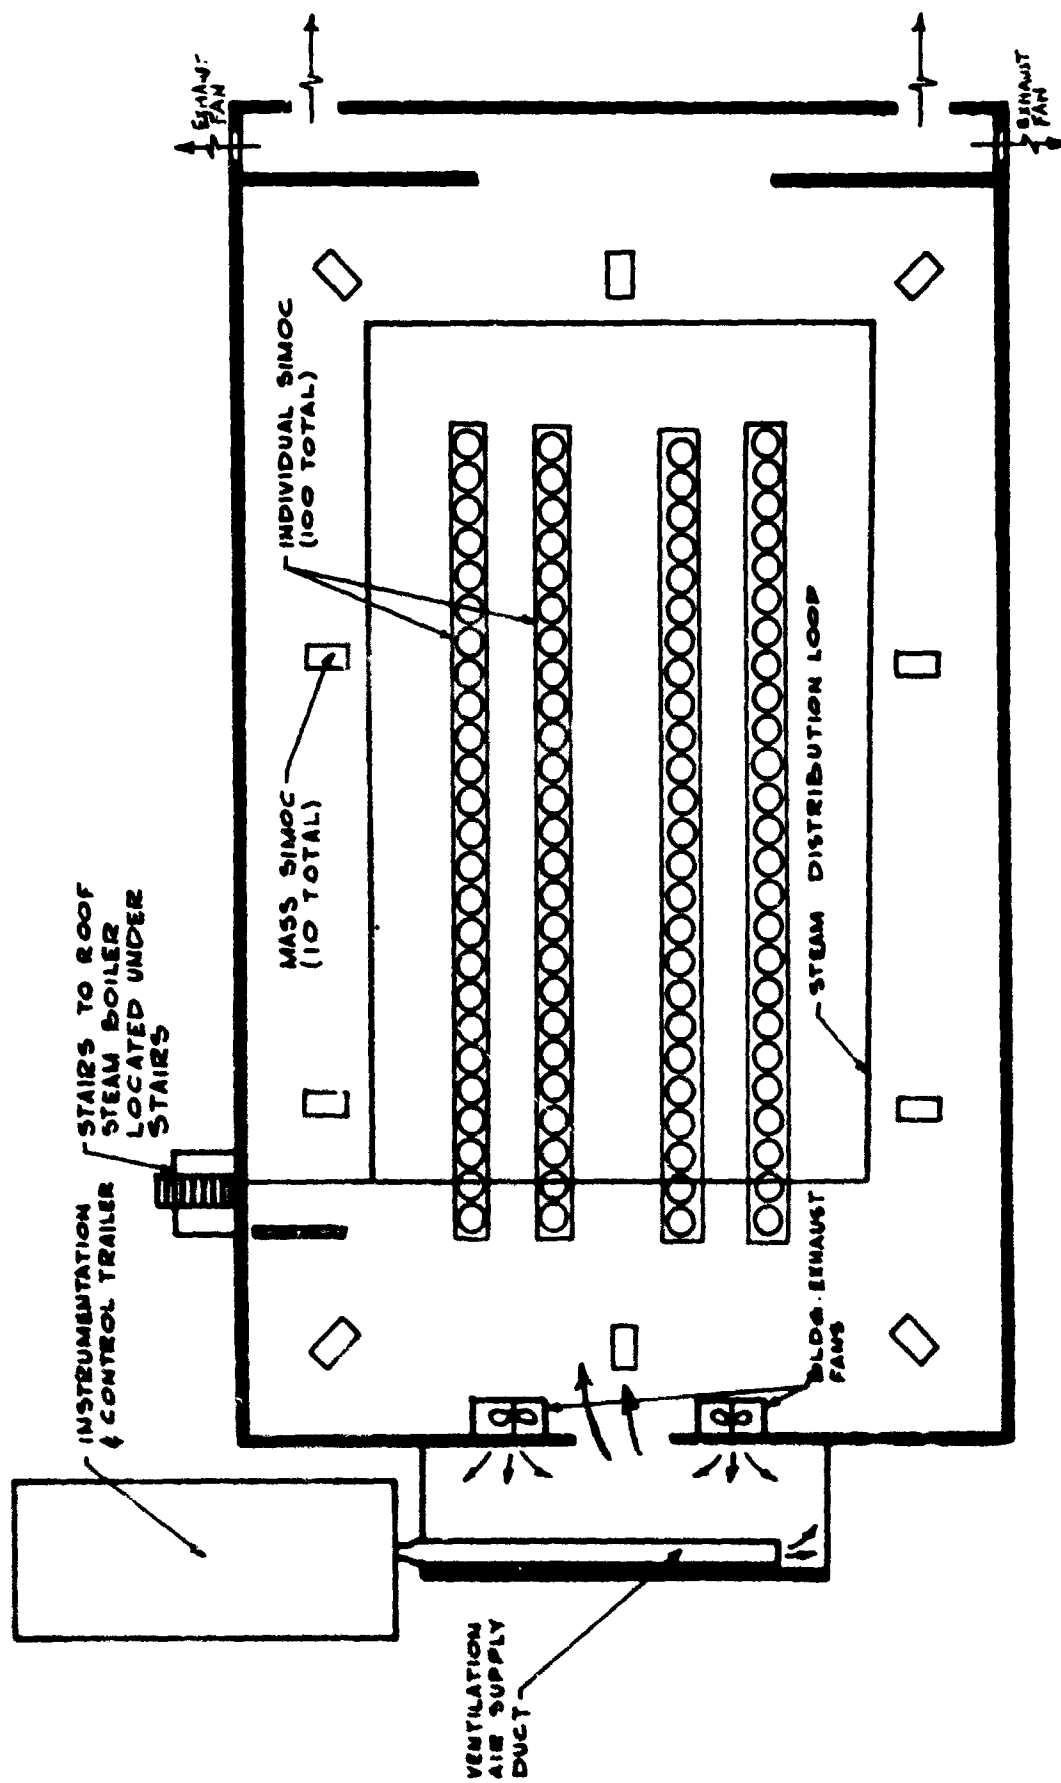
Plan of test shelter with simoc locations and equipment.
